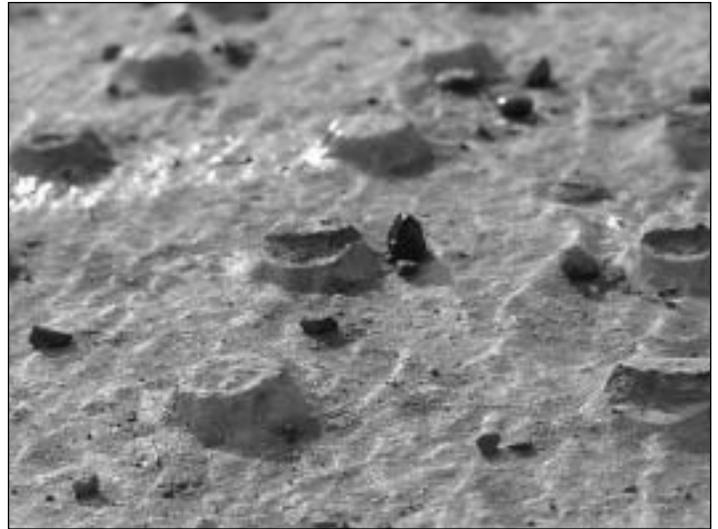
Strongwall SWADA 2000, Fairbanks: Note domes chipping off.
